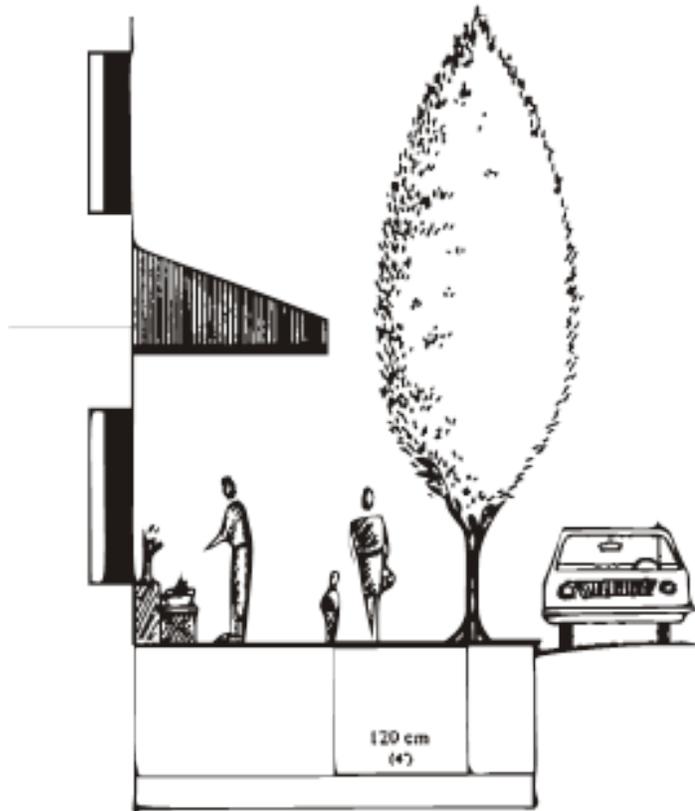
Narrow Boulevard Columnar Tree Awning Section
